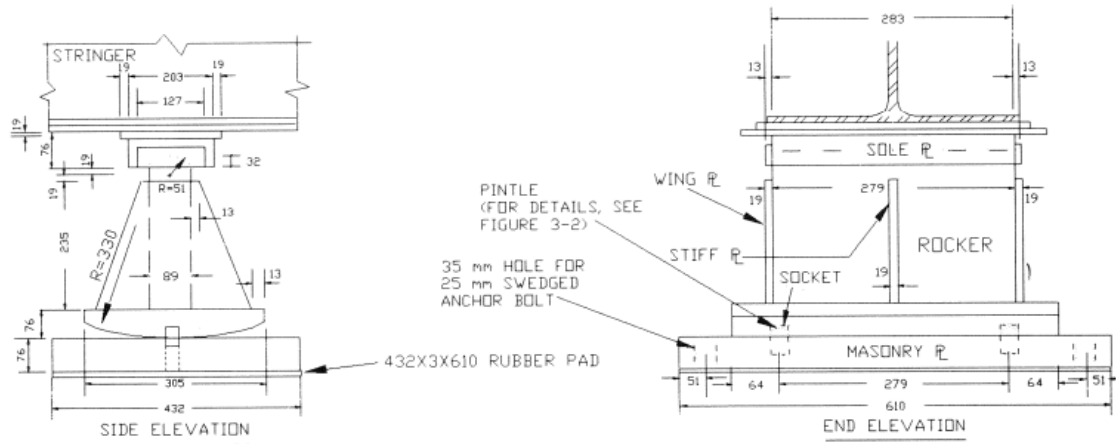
High-type rocker bearing specimen (Mander et al., 1996)
